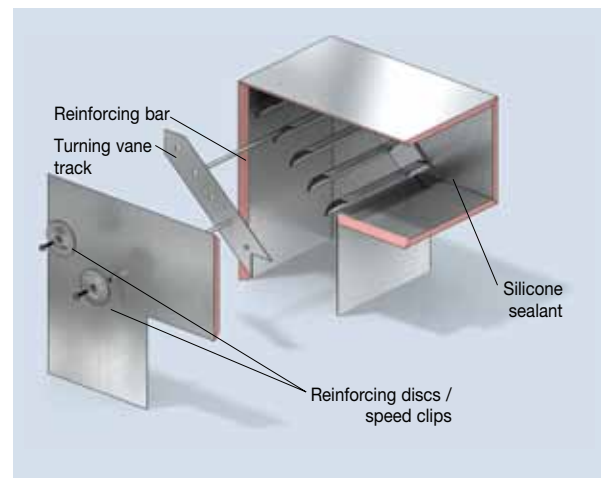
Turning Vane Installation – Reinforcing Bar System
